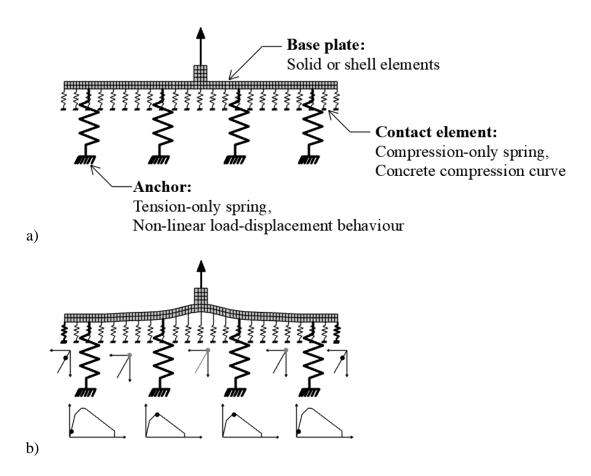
Spring model for anchor groups against concrete cone failure a) unloaded model, b) centric tension load is applied on the model
